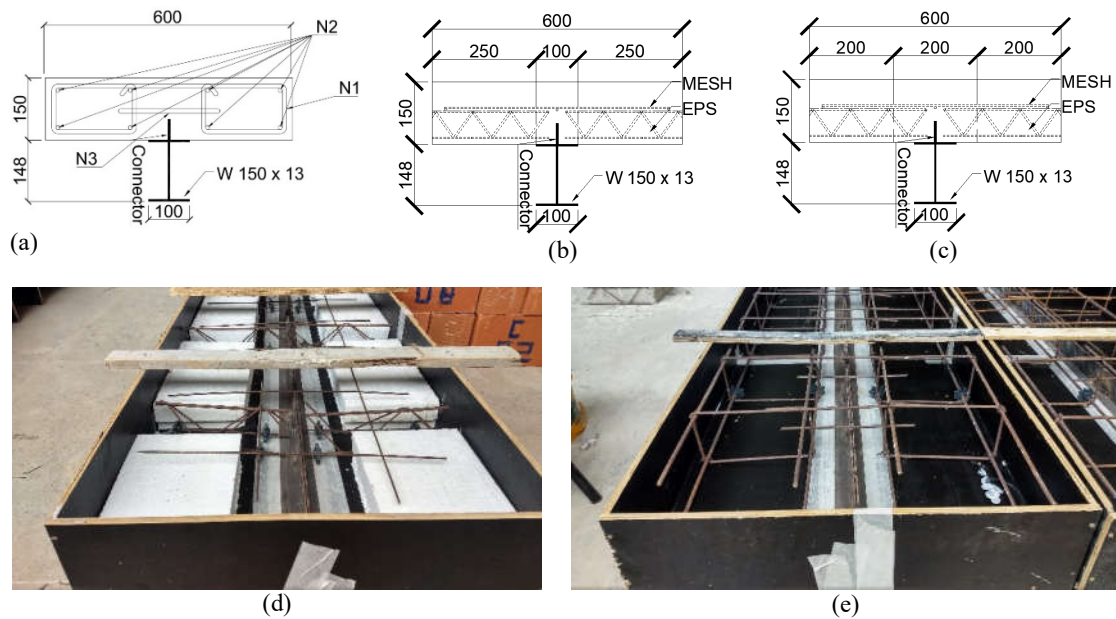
Composite beam cross-sections: Solid slab (MAC) (a); Ribbed slab 10 cm (TRE 10) (b); Ribbed slab 20 cm (TRE 20) (c); TRE Slab framework (d); MAC slab framework (e).
